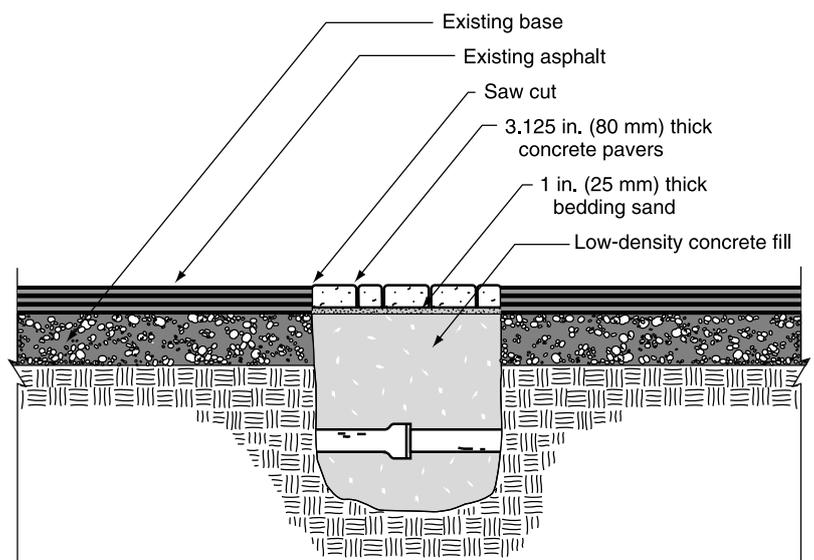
Cross section of utility cut repairs with concrete pavers in London, Ontario
